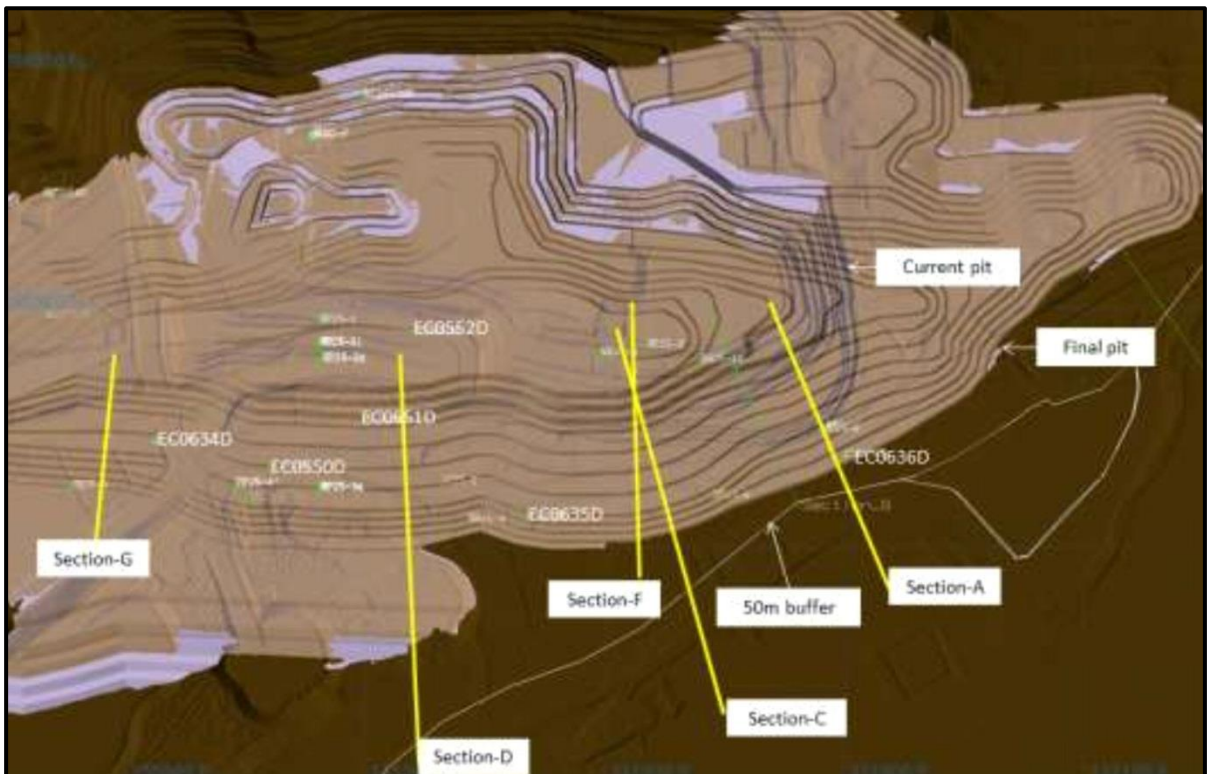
Snowden Geotechnical Cross Section Cut Locations (2012)
